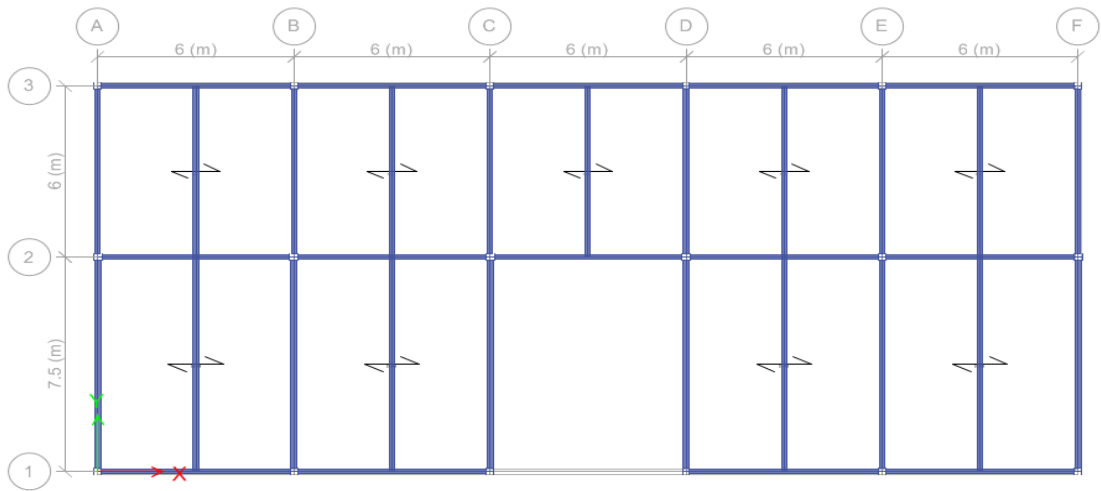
Typical floor plan of the dormitory building (IR8F-I).
